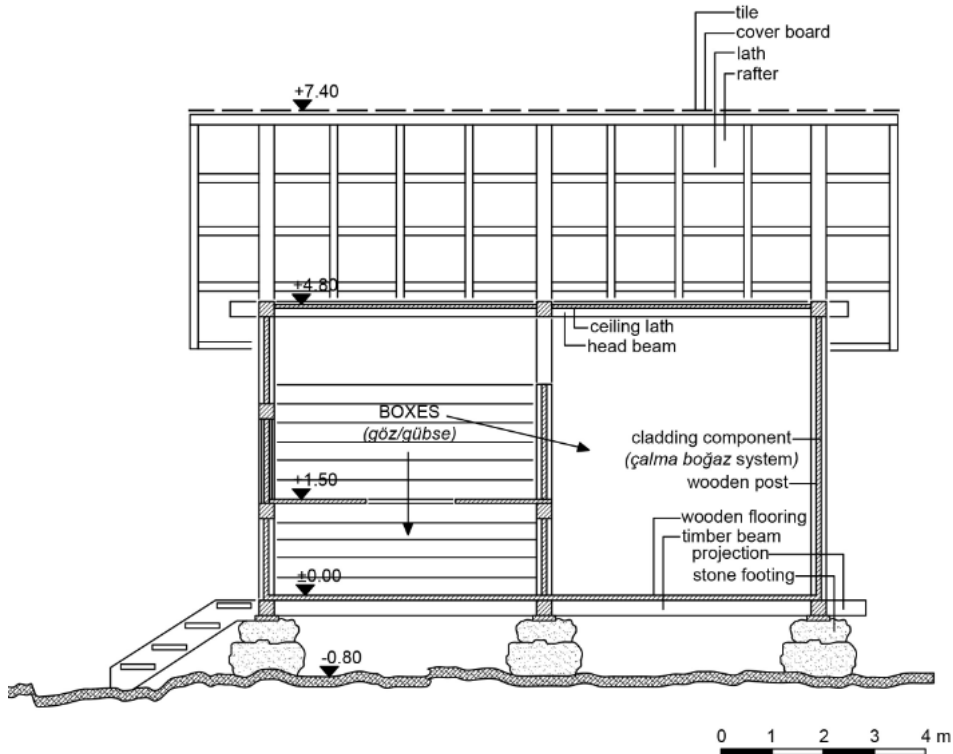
Longitudinal section of plan type without sundurma (porch) (Author)
